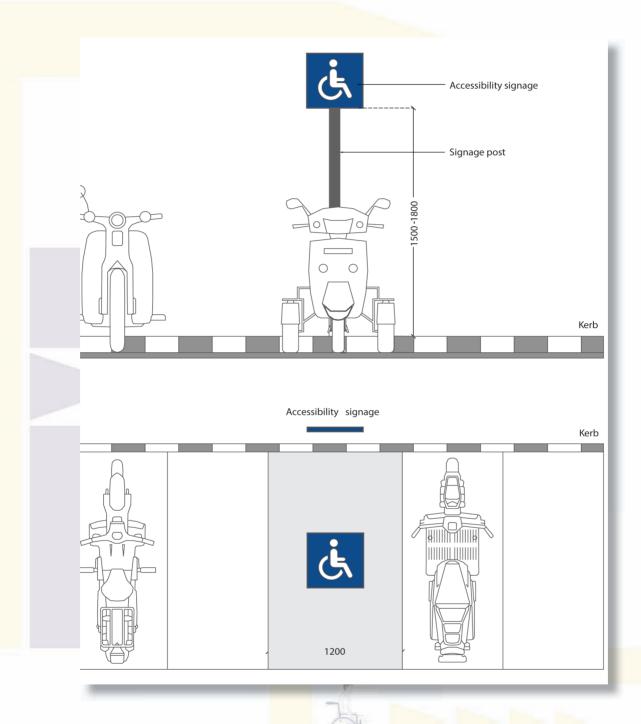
Accessible Parking Standards for Four Wheelers & Two Wheelers
